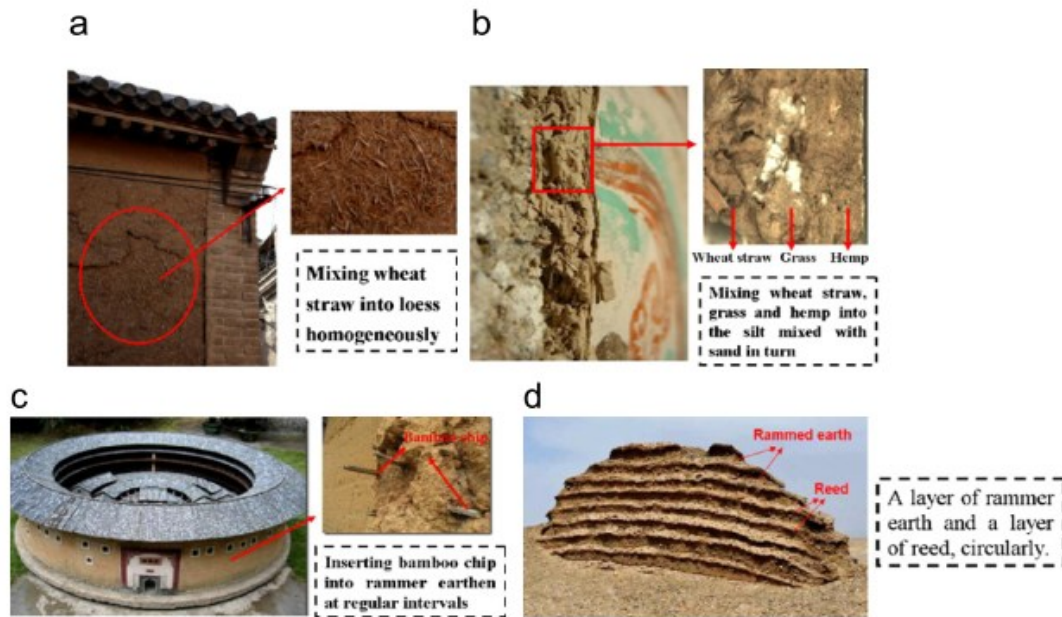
Traditional buildings constructed of reinforced soil (a) Rammed Residence, (b) Mogao Grottoes Mural, (c) Hakkas Earth Buildings, (d) Han Great Wall (Min Lia, 2012)
